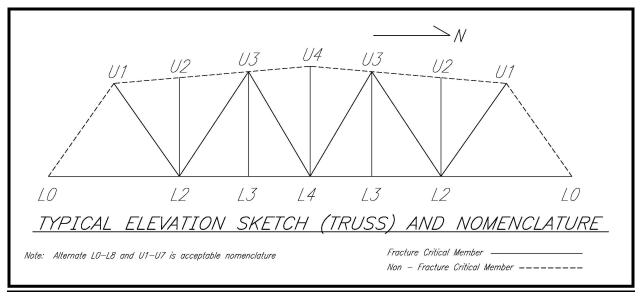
5-4: Example Inspection Plan Sketch (Truss)
